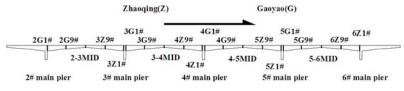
The background bridge and cross sections with embedded sensors in the SHM
